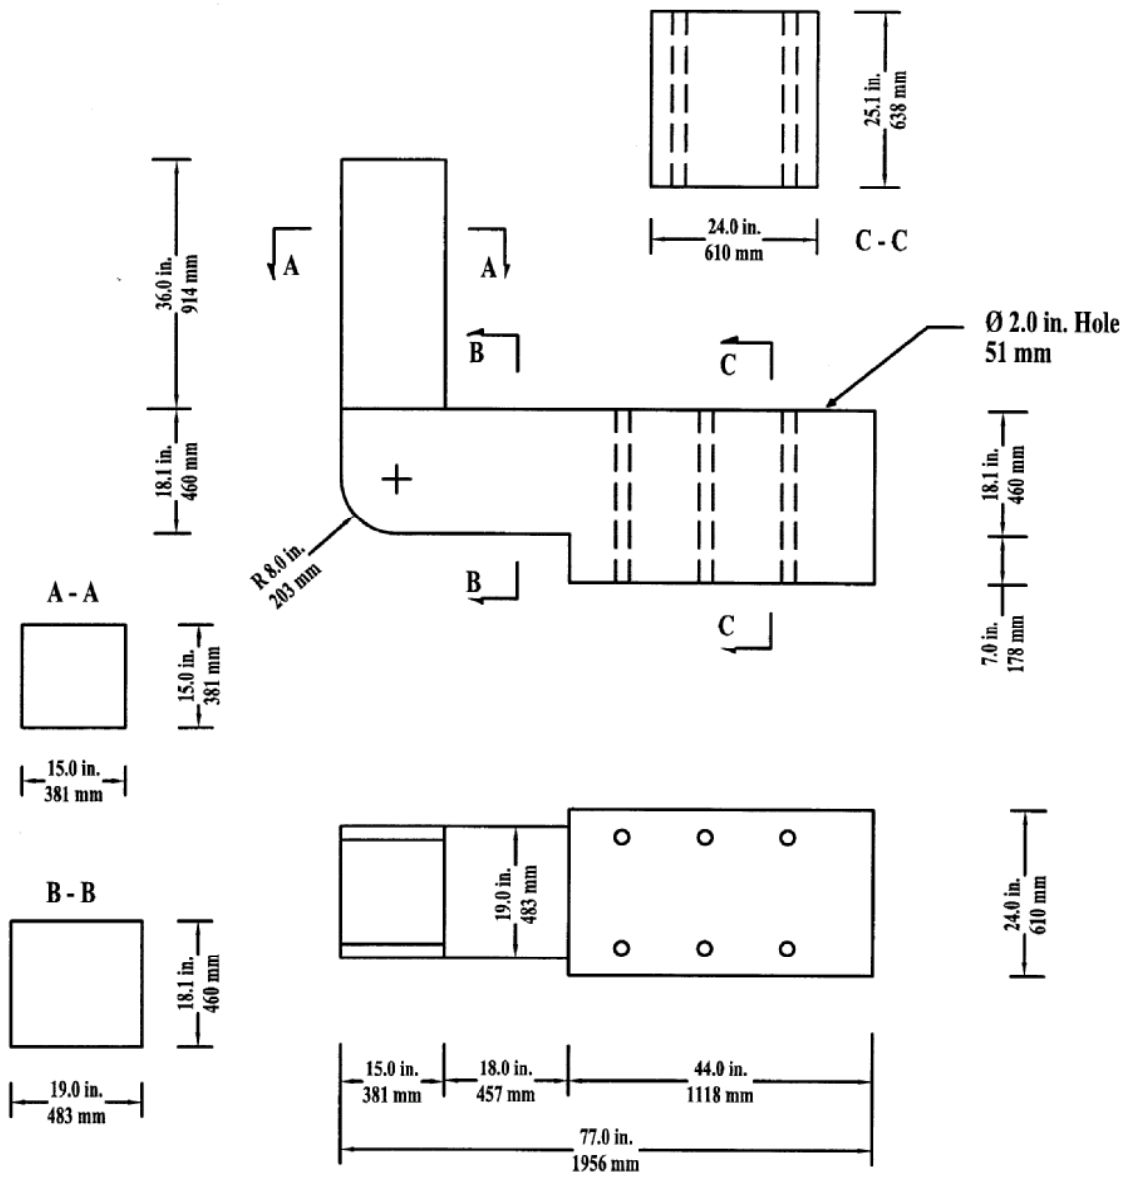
As-Built Short Outrigger Specimens Dimensions
